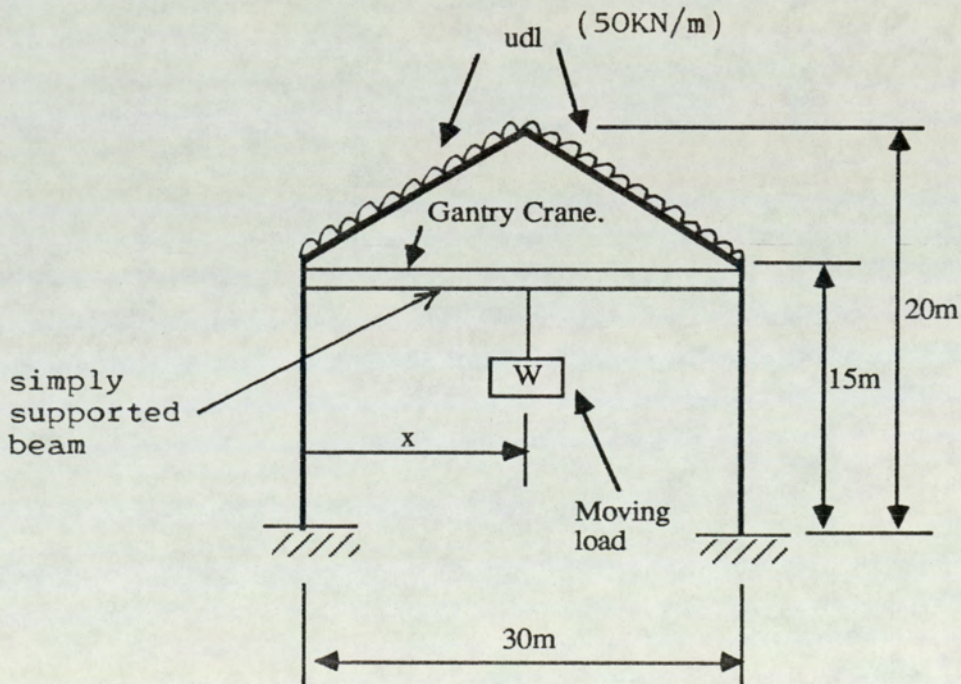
Typical Workshop Portal Frame with Column Loadings.
